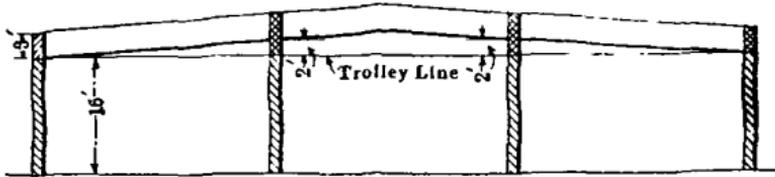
is a study sheet prepared by these engineers to show the results of an investigation of three different plans of roofing three units in one building. Scheme No. 1 shows the roof high on one side and sloping all one way. Scheme No. 2 shows the roof high in the center of the center unit and sloping two ways, scheme No. 3 shows the roof high over the center of each unit and sloping two ways over each unit. In each scheme the slope per foot is the same. As the necessary distance between track and trolley was fixed at 16 ft., it was considered that all wall used above the horizontal line 16 ft. above the tracks should be charged against
